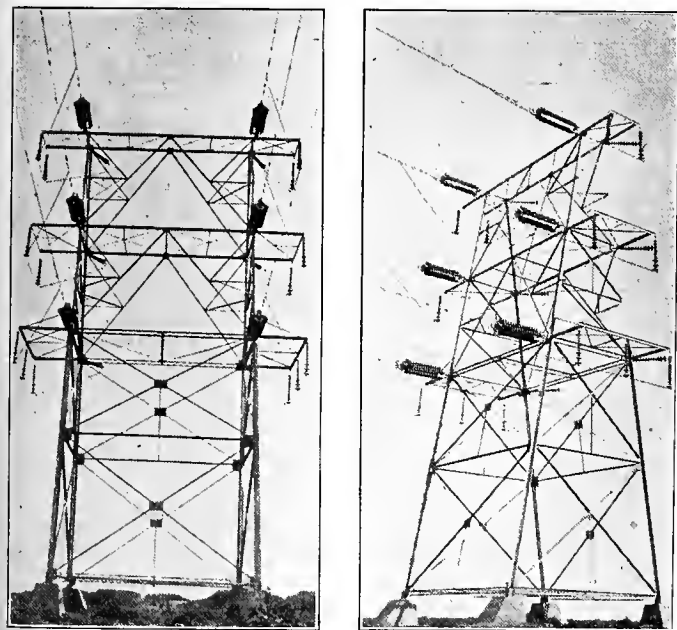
Completed anchor tower showing appearance of dead-end assemblies, etc. Note rigid copper tubing carried past tower on three insulator strings. Flexible copper cable is strung through this tubing for rigidity.
